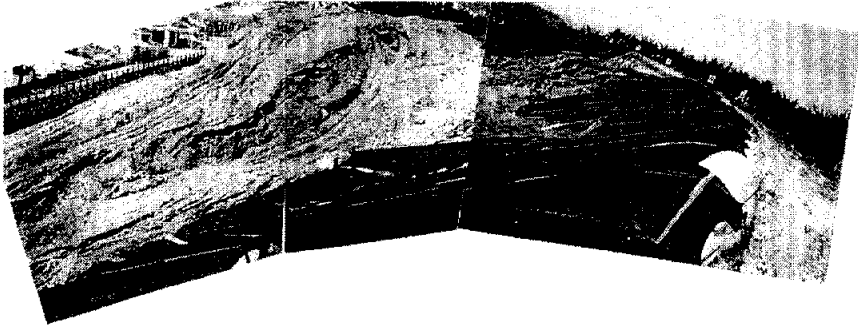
Photograph of the second landslide(tension cracks developed parallel to road).
